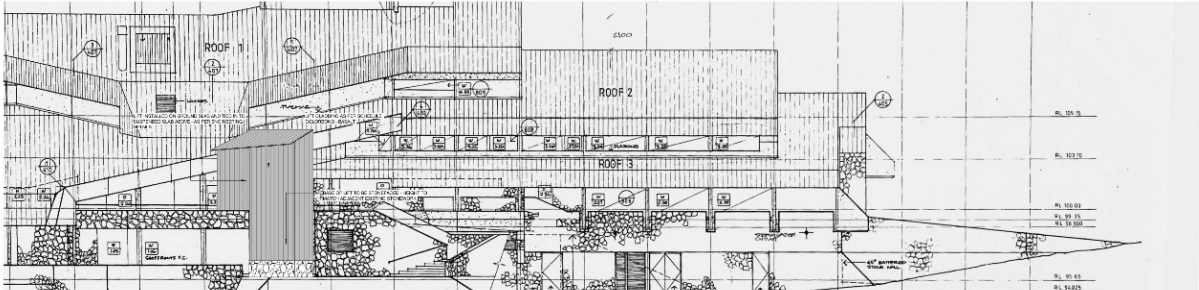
Elevation of Perisher Centre with new lift structure when viewed from the carpark and northern foot bridge.
